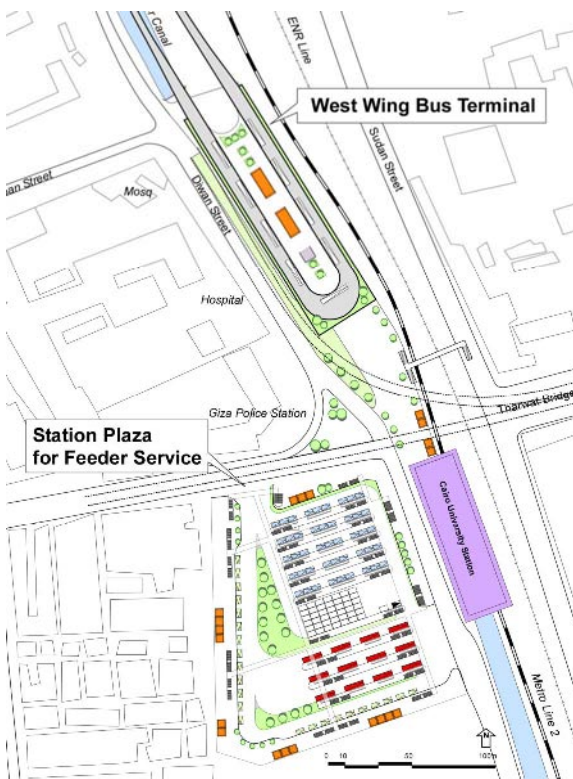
A Conceptual Layout of Intermodal Facilities at Cairo University Station Area in 2022
